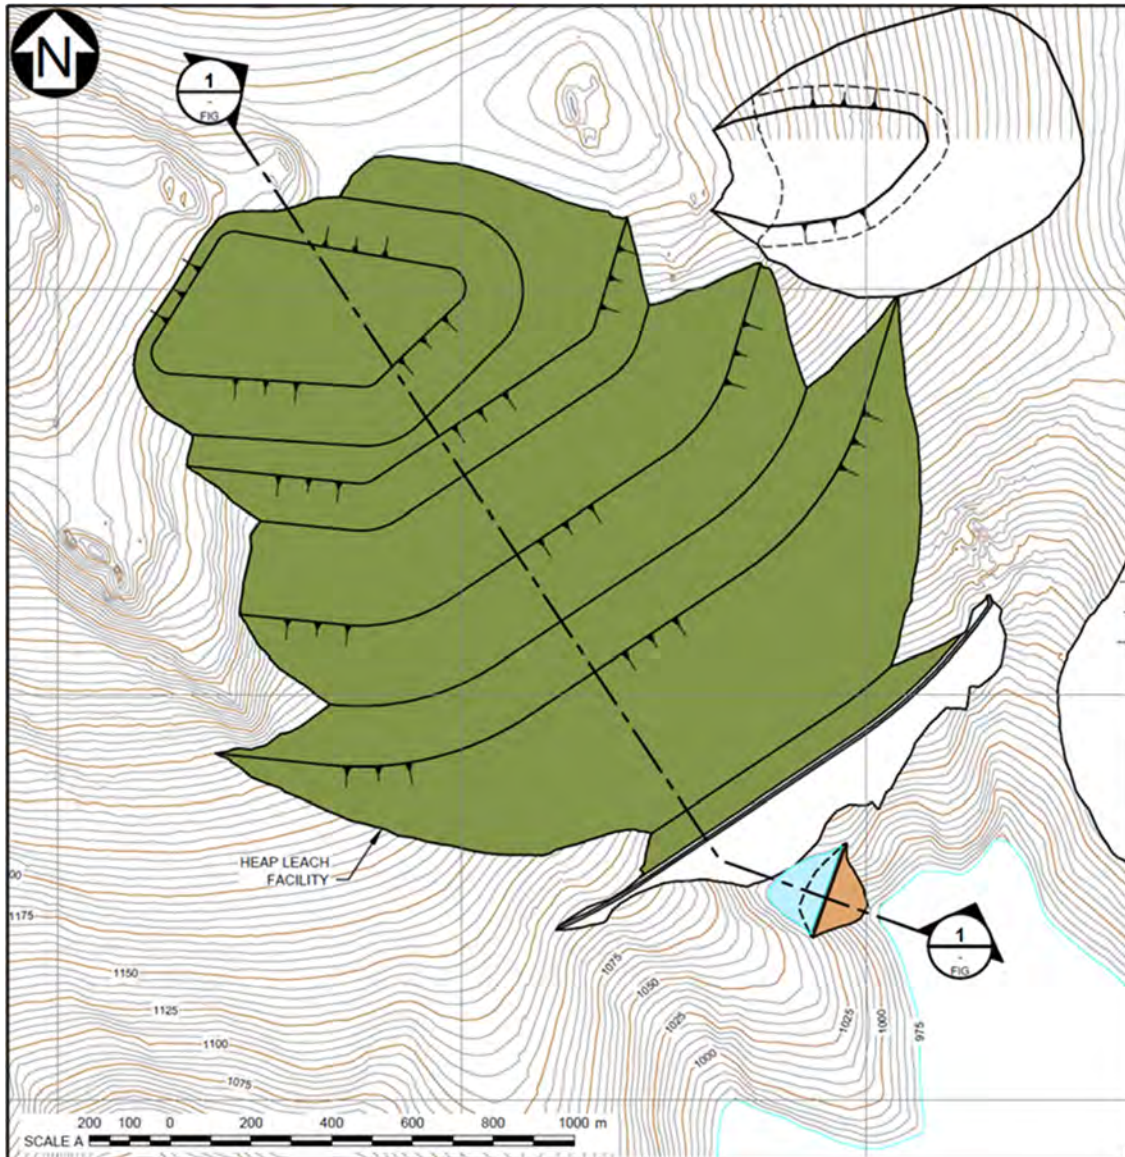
Heap Leach Facility General Arrangement (KP, 2021)
